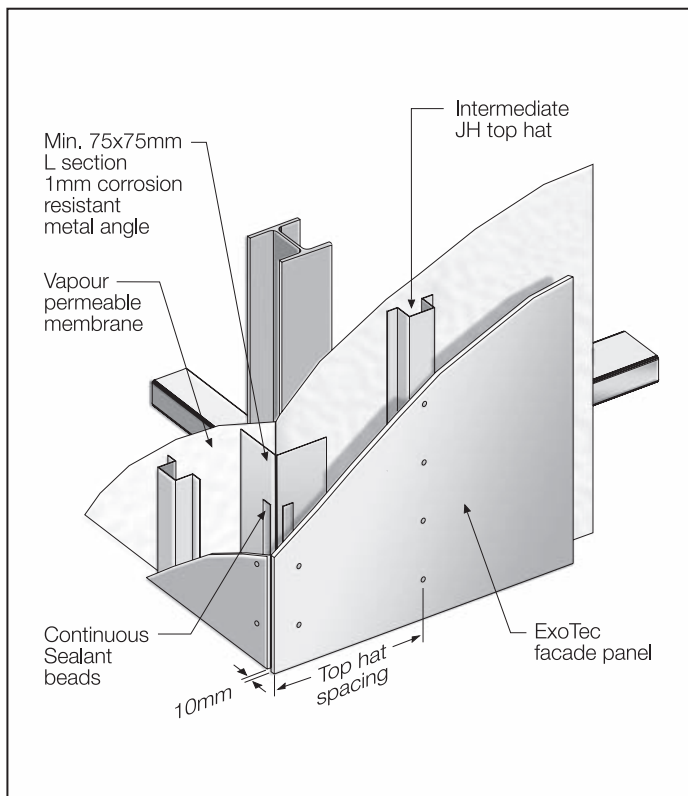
EXTERNAL CORNER CUTAWAY DETAIL
